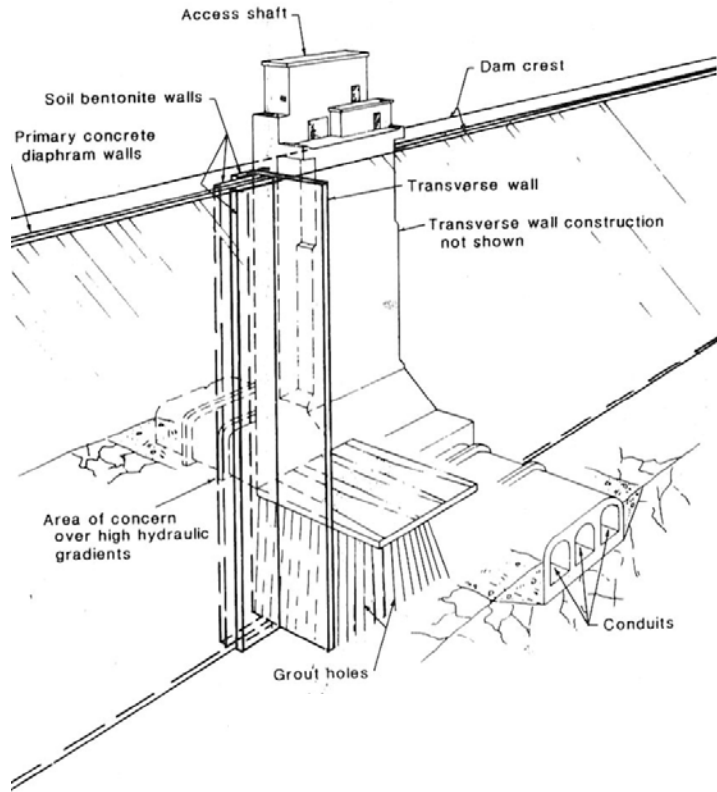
Wall Construction at Fontenelle Dam Outlet Works (Cyganiewicz, 1988).
